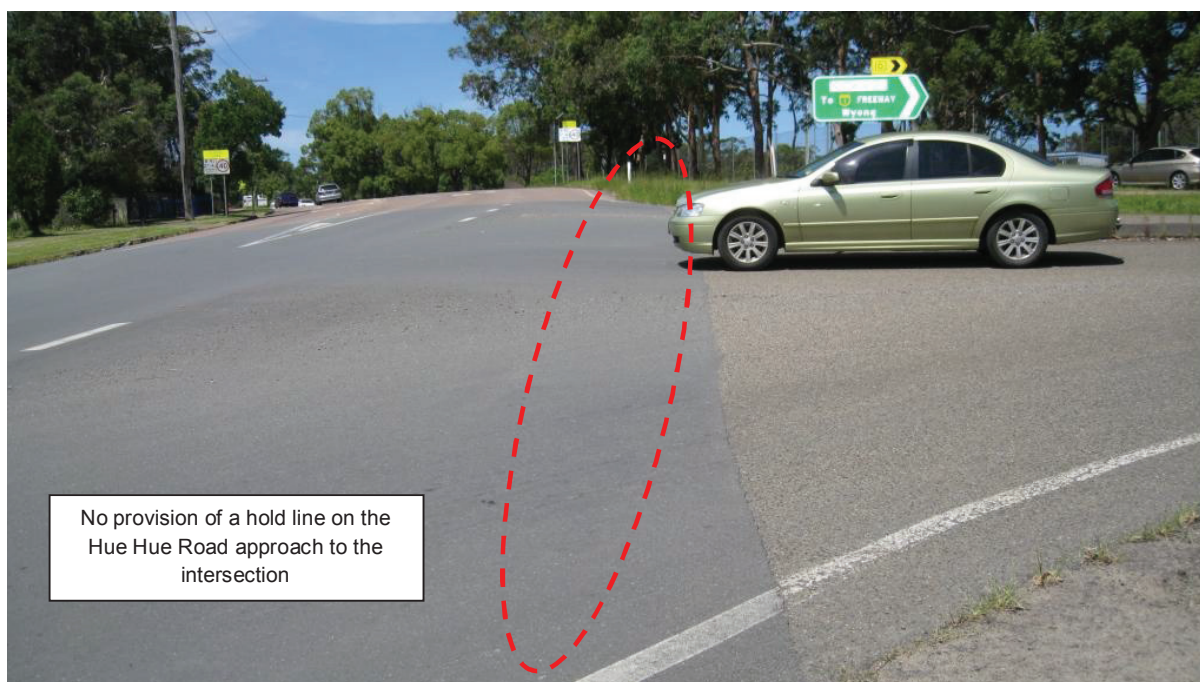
Wyee Road, looking south east toward its intersection with Hue Hue Road
